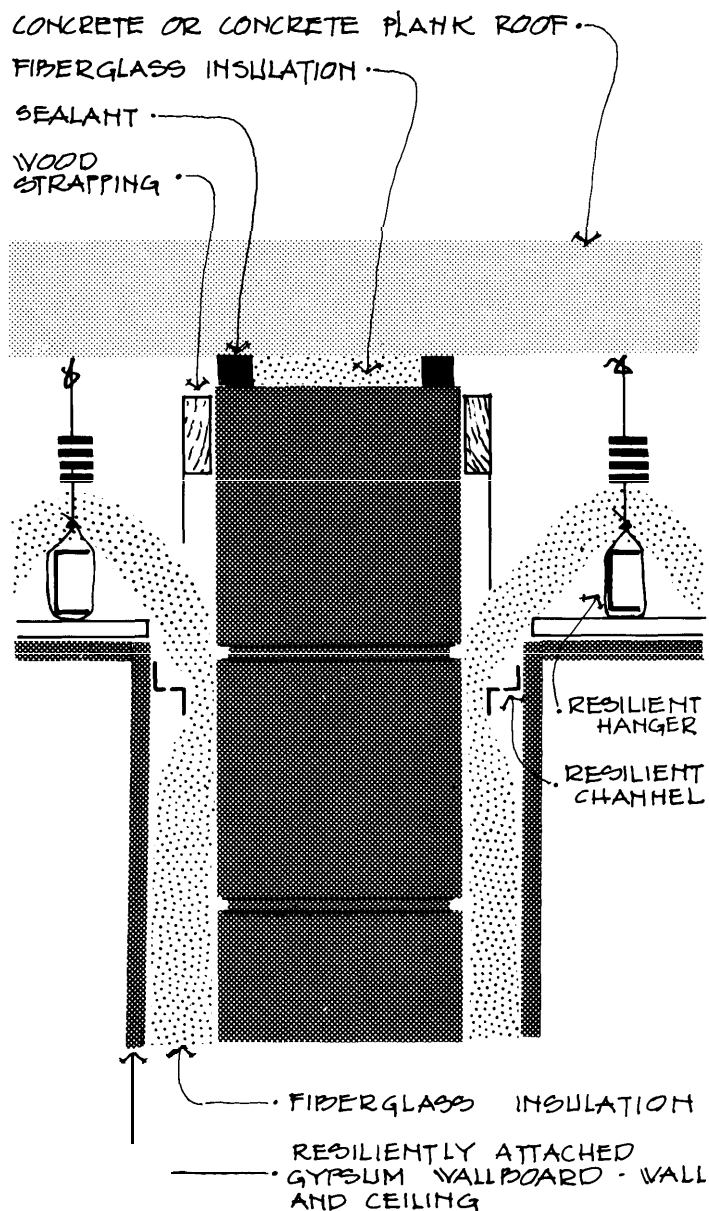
Resiliently Attached Gypsum Wallboard Skins to Improve Performance of Single Masonry Walls
